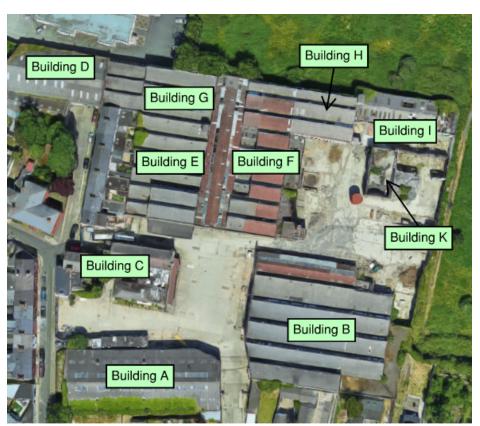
Aerial view of site showing buildings to be demolished & building footprints.
